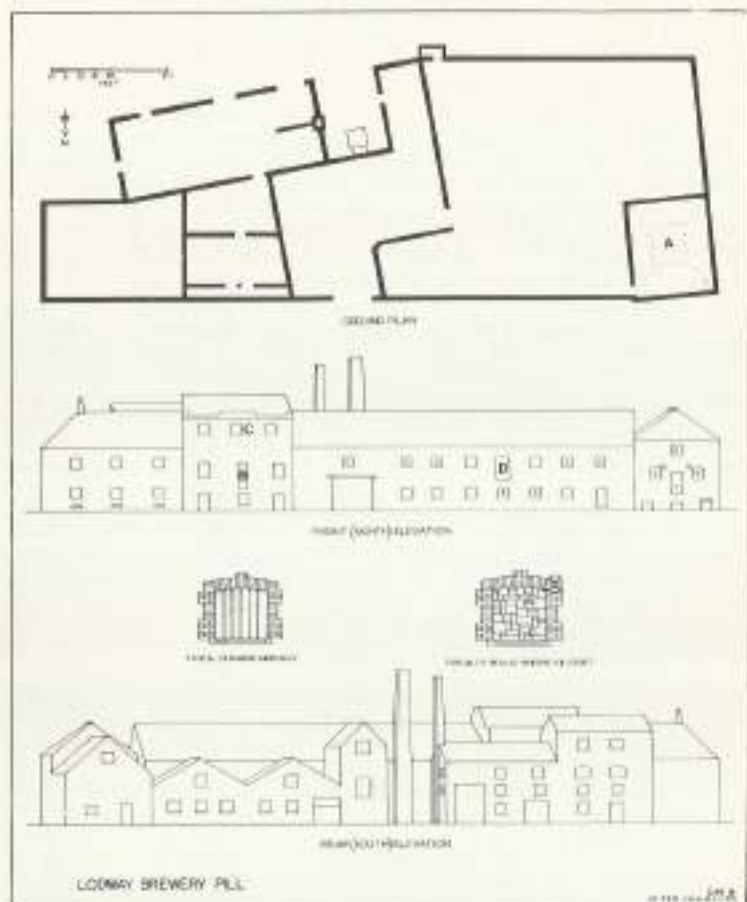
Plan and elevation of Lodway brewery, 1981 (only approximately to scale).
